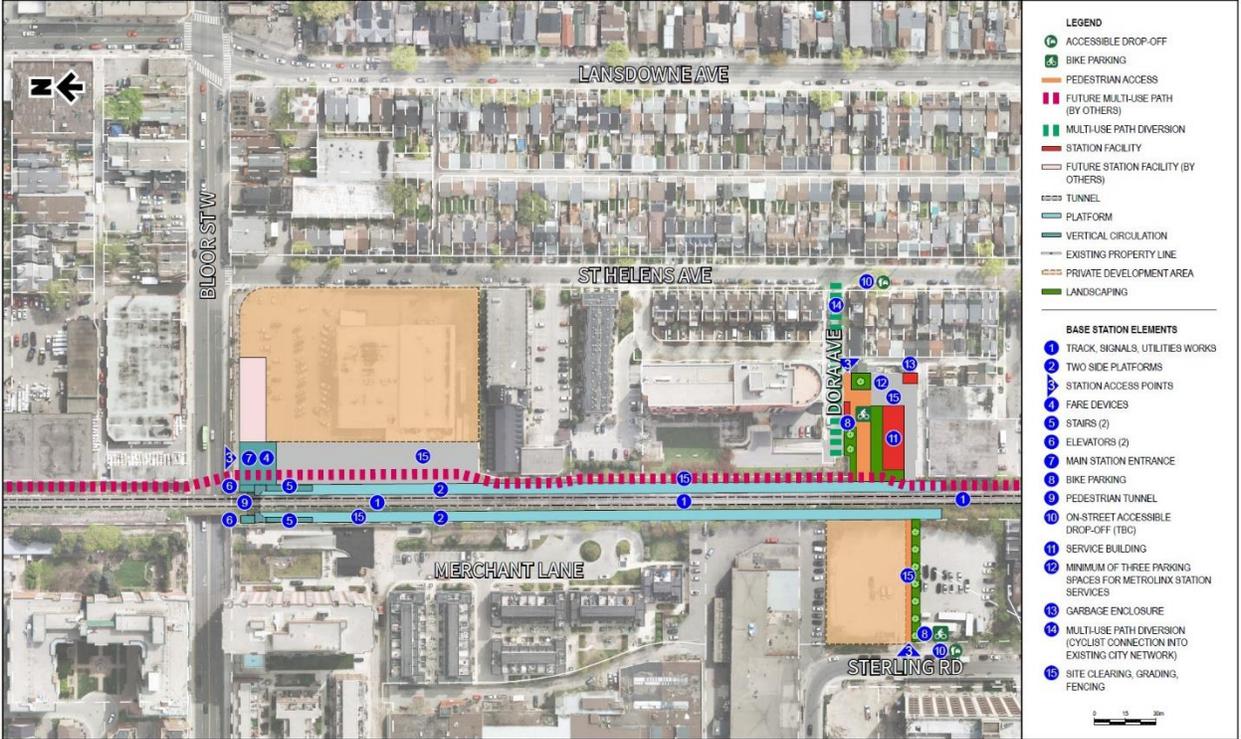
Conceptual plan of Bloor-Lansdowne Station. Source: Metrolinx (December 2020). Note: Station plan shown above is indicative, and does not represent a final design.
